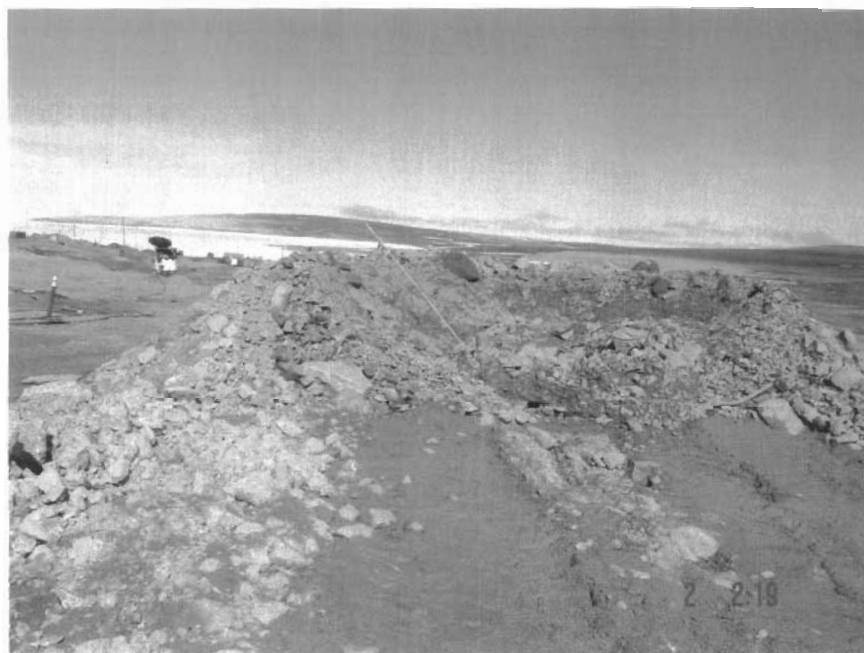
Boar Hole, disposal location of contaminated soil from Fuel Oil Spill (02-394).
